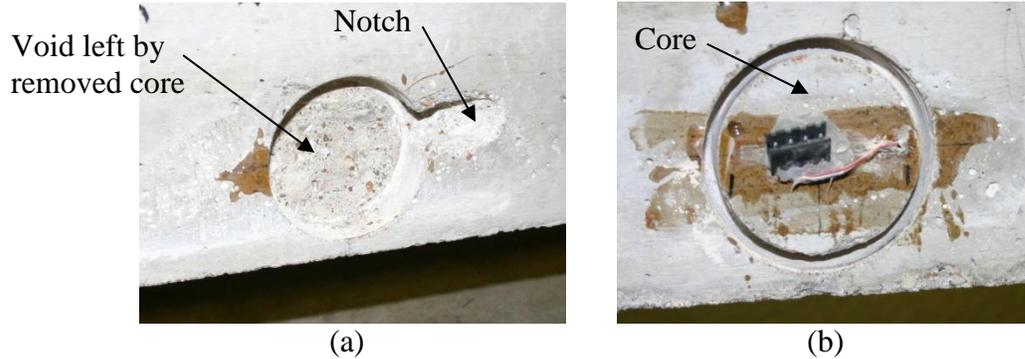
a) After the Core Has Been Removed, b) Core Intact
